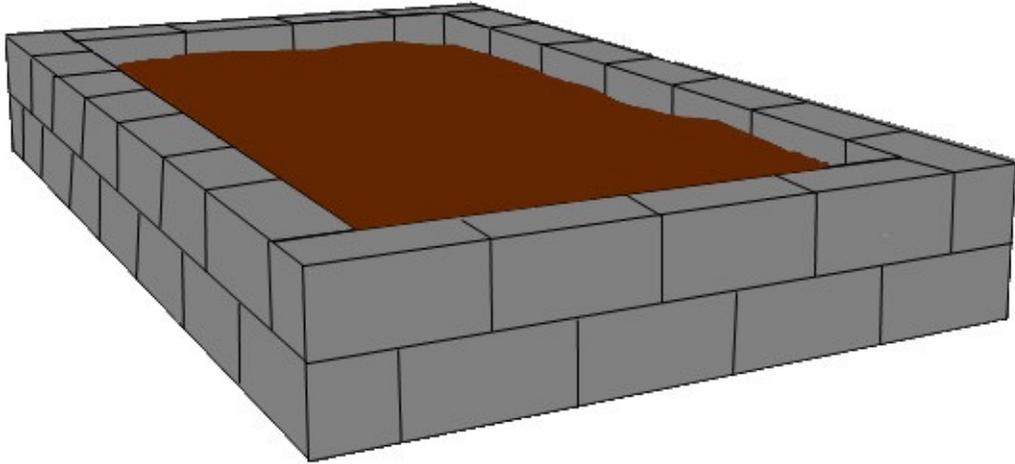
Another example of Concrete Block Pattern used to Build a Raised Bed.
